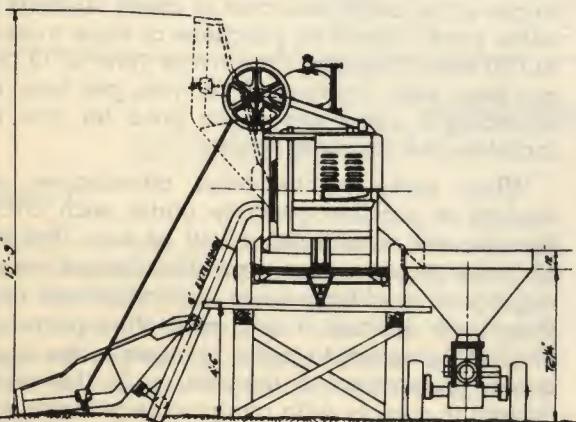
Model 160 setup under 14-S building mixer with Power Loader extension on platform. Mixer may also be mounted on trailer or barge for use with power loader extension.
